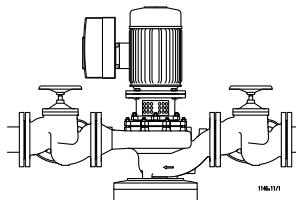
Vertical installation/fastening with pump foot (accessories, available on request)
